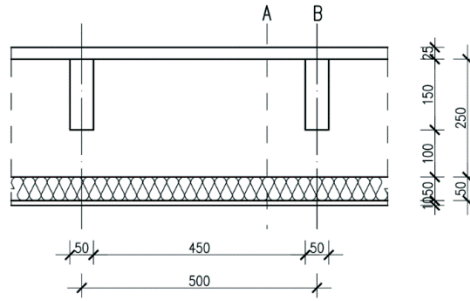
The cross-section of a wall made of a mix sprayed on the formwork
